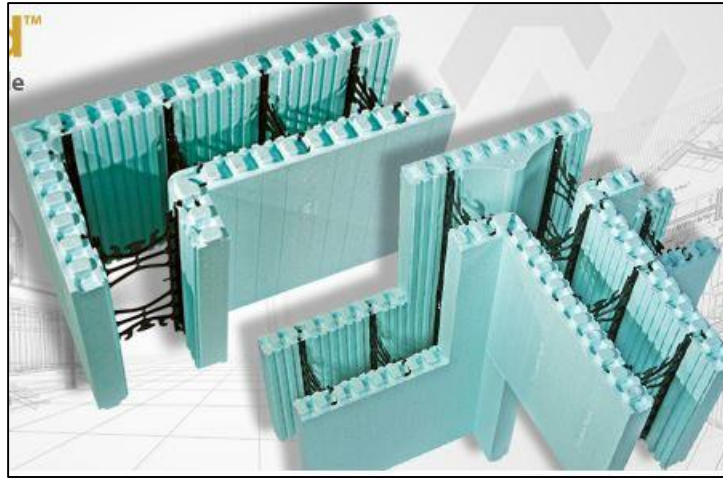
Insulated Concrete Forms (Source: NUDURA Integrated building Technology)
